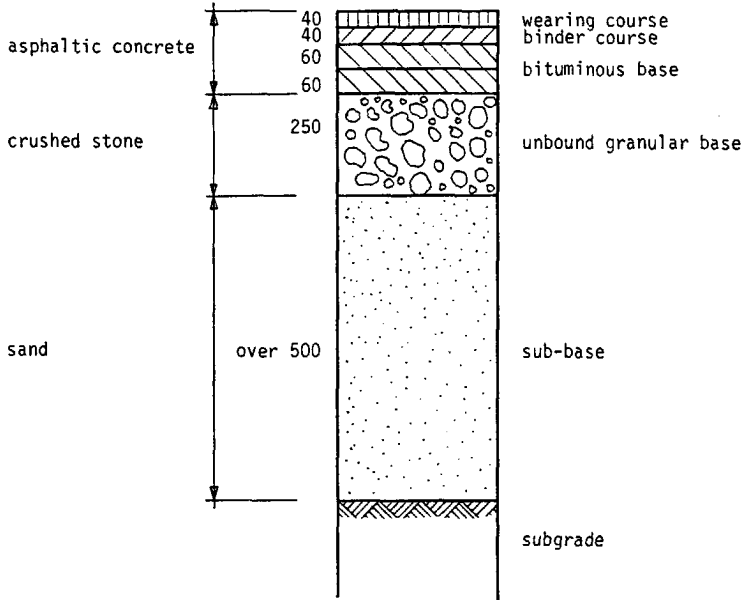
Typical pavement construction for a primary road in the Netherlands (layer thickness in mm).
